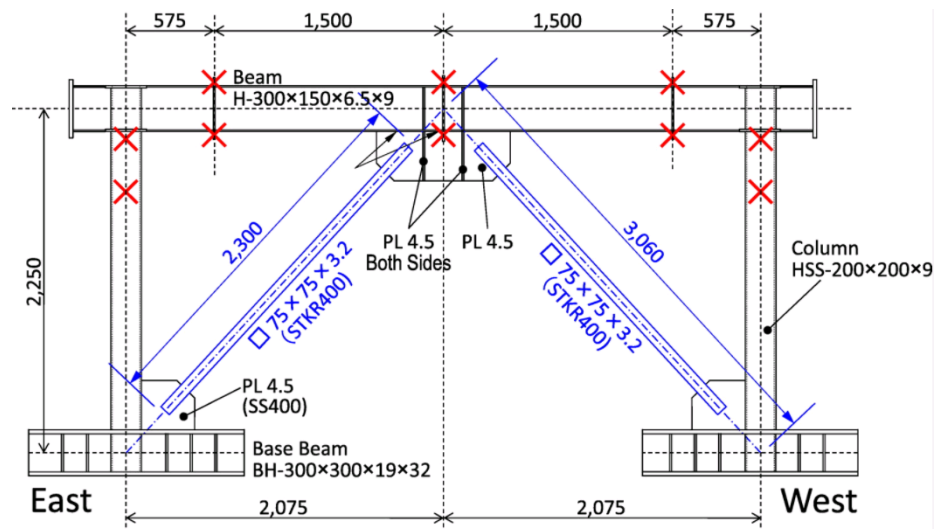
Shake table test specimen and out-of-plane bracing points (mm) (Okazaki et al. 2013)
